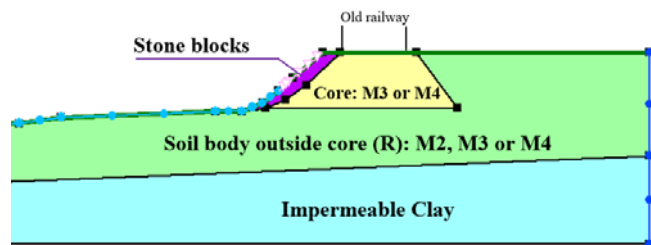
Overview of the landfill zones: filling under railroad (C) and the outside the railroad area (R)
